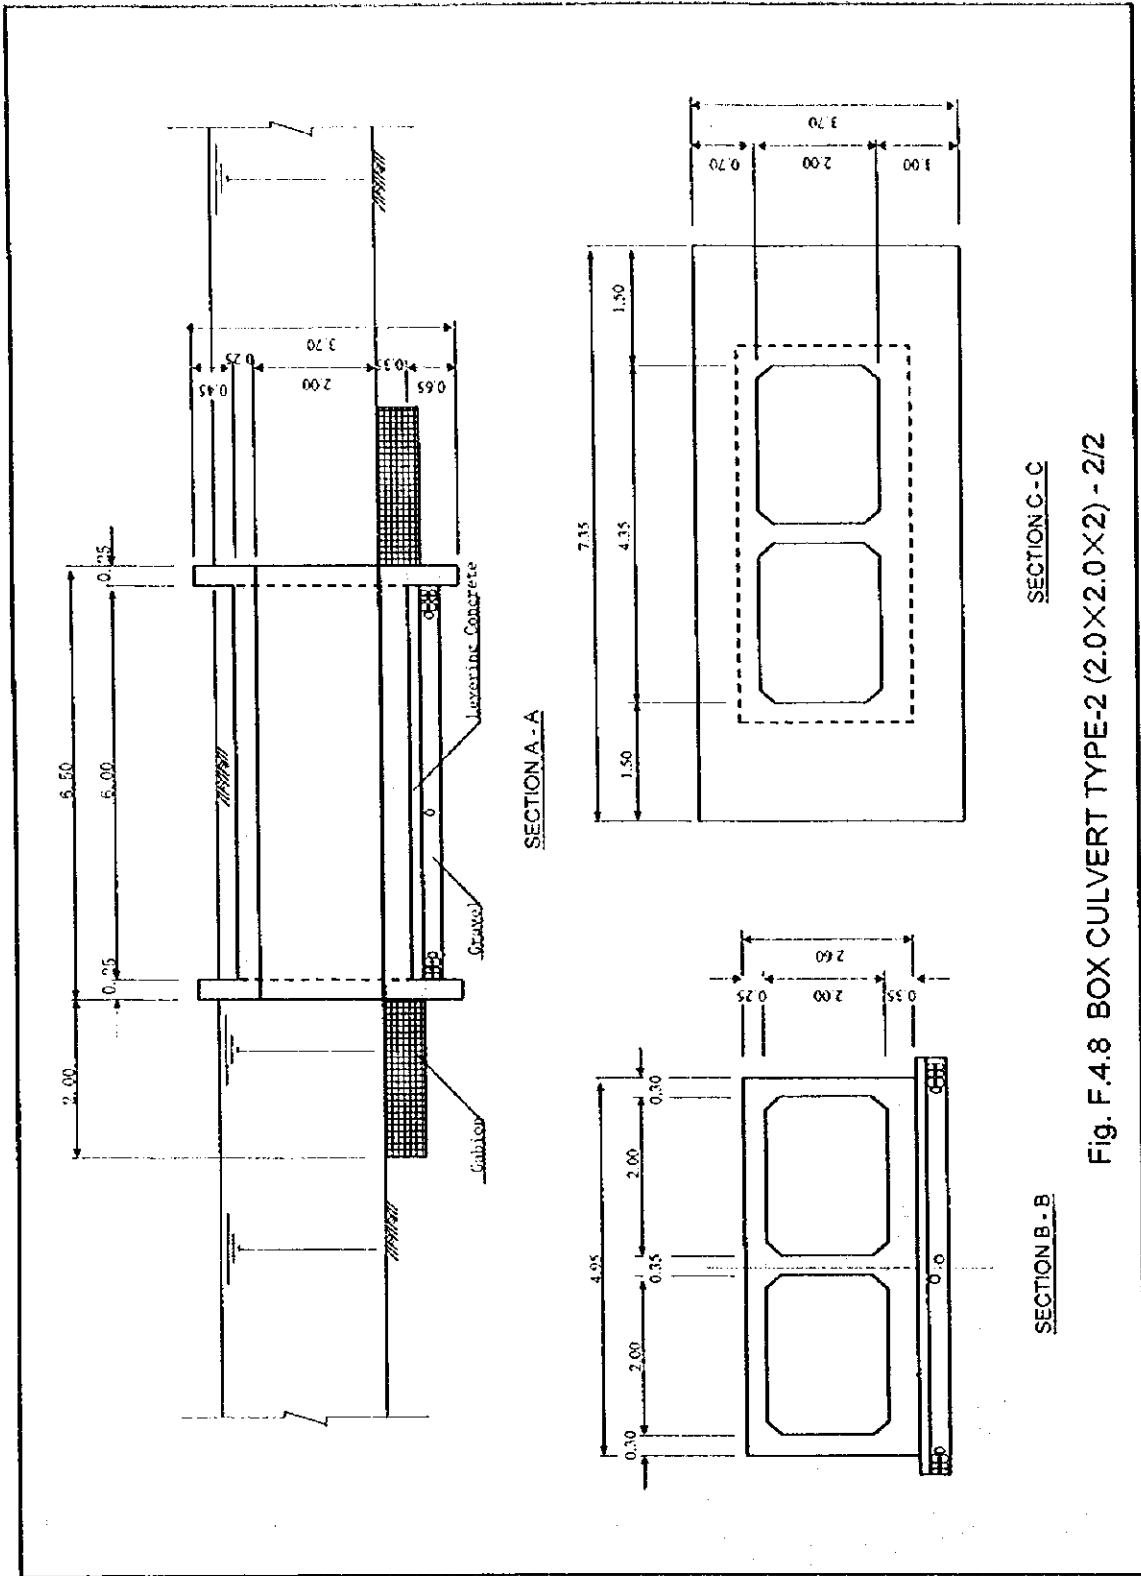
BOX CULVERT TYPE-2 (2.0X2.0X2) - 2/2
